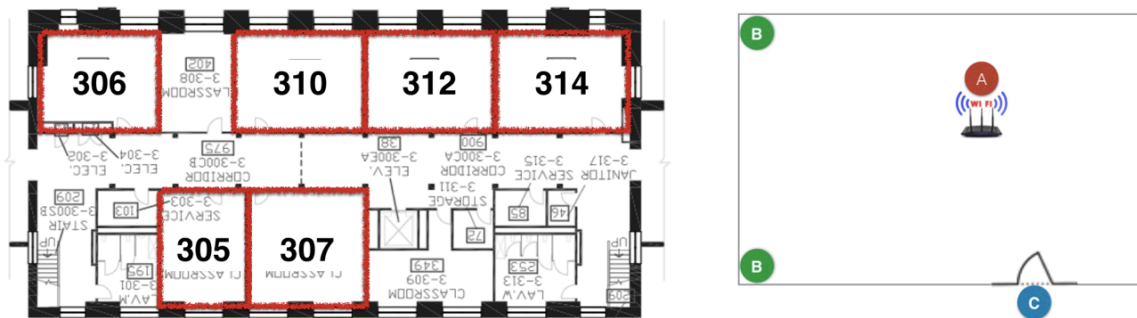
Floor Plan (Left) and Reference Points for each room (Right).
